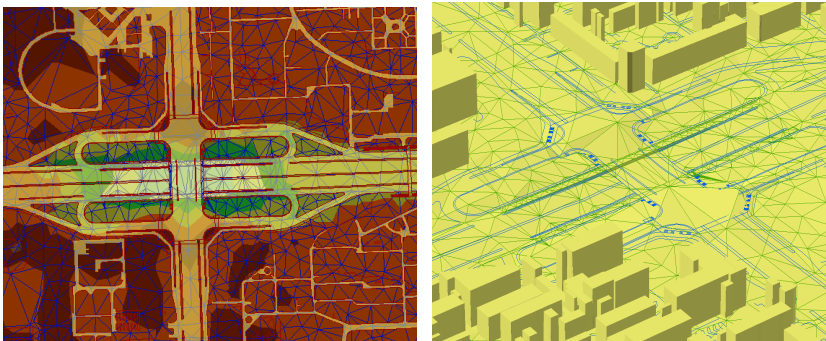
Terrain Build with Buildings for Anhua Bridge
